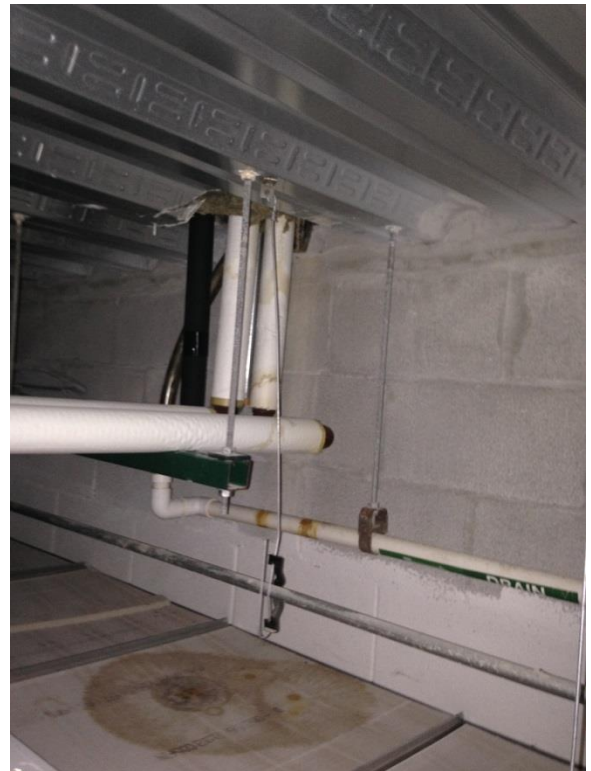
Room 141, water damage/stain on pipe and ceiling tile
